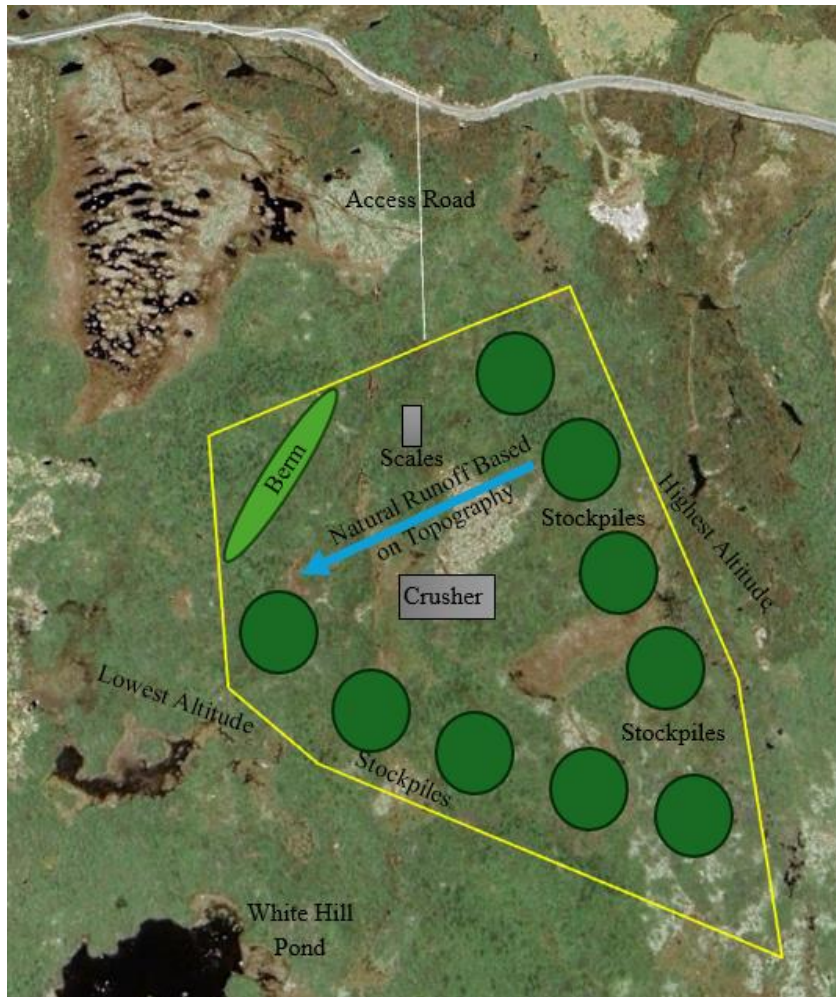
Quarry Layout Plan with Proposed Runoff Based on Land Topography
